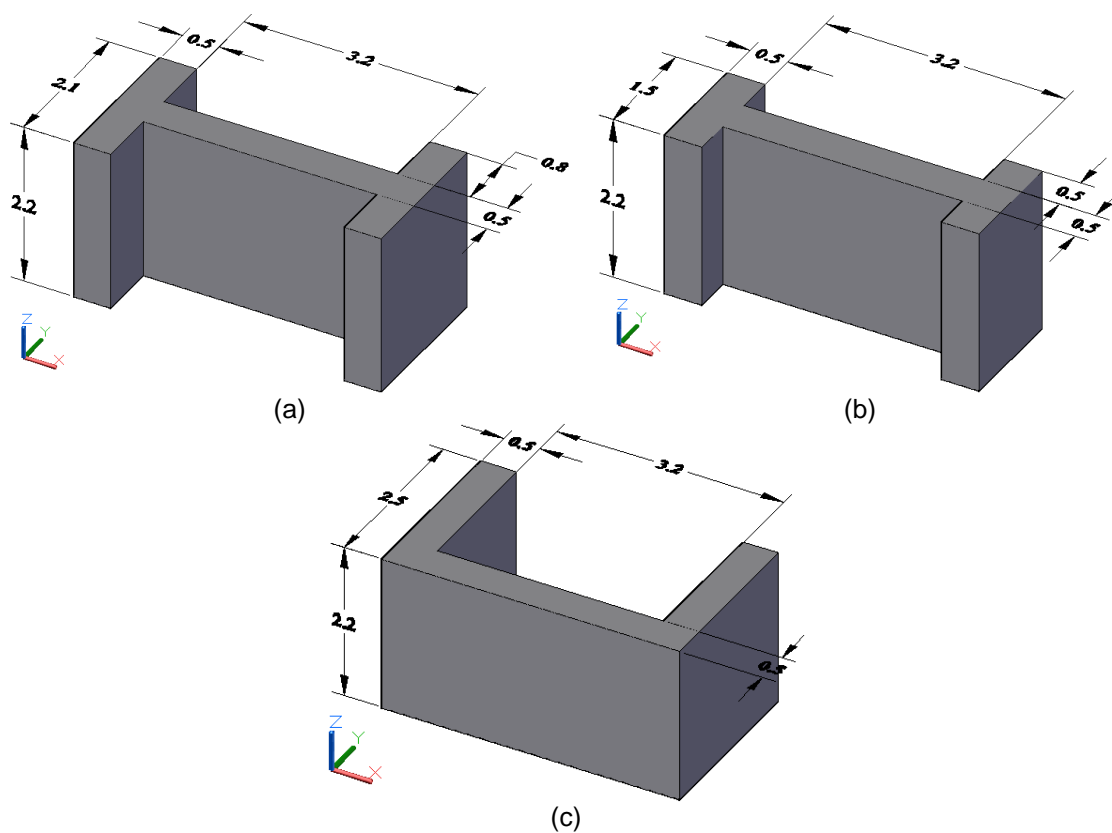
Models of the walls (units in m): (a) In-plane wall with 80 cm wing length (b) In-plane wall with 50 cm wing length (c) Out-of-plane wall
